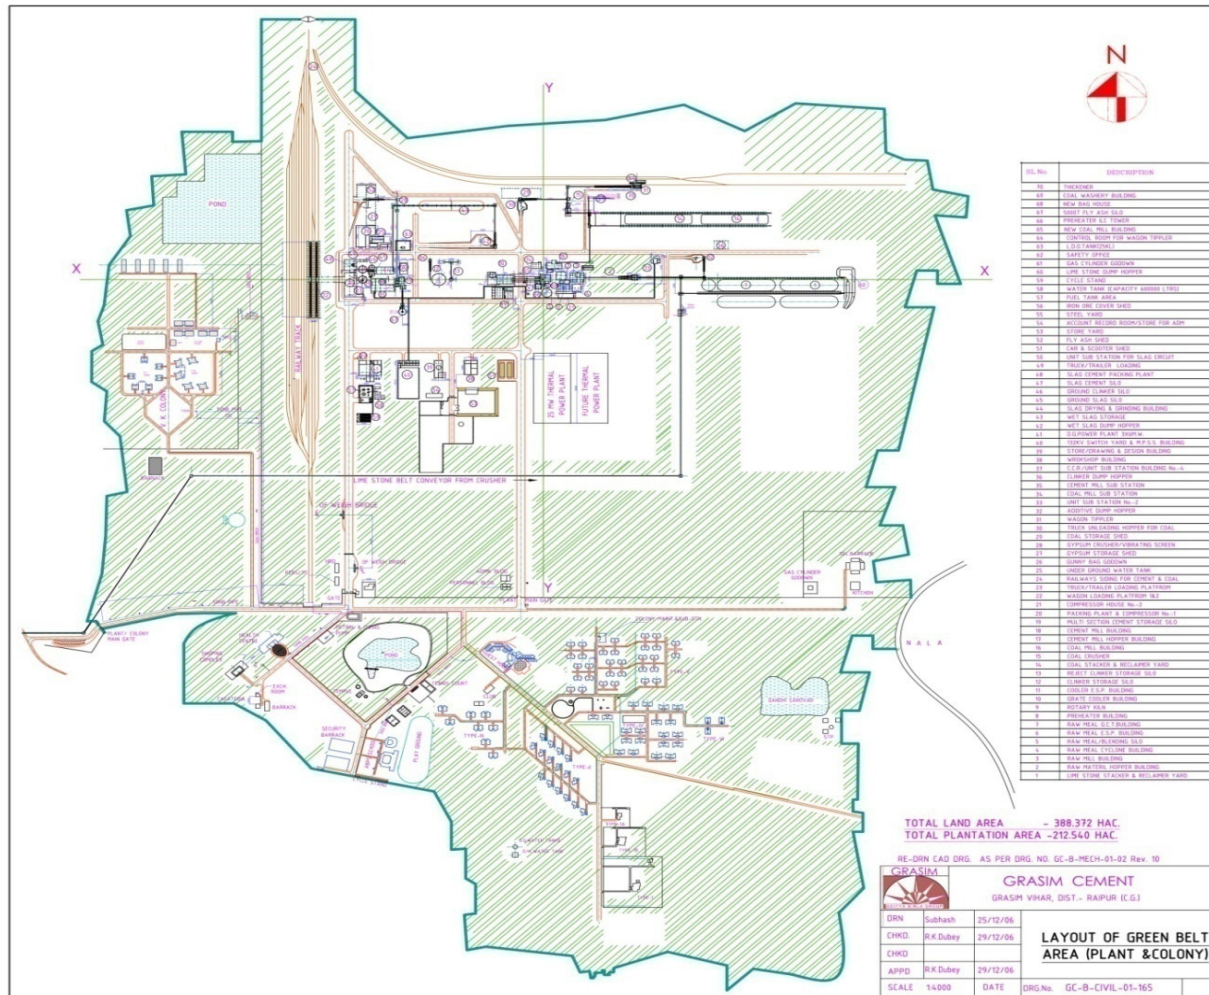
PLANT LAYOUT (EXISTING & PROPOSED)
